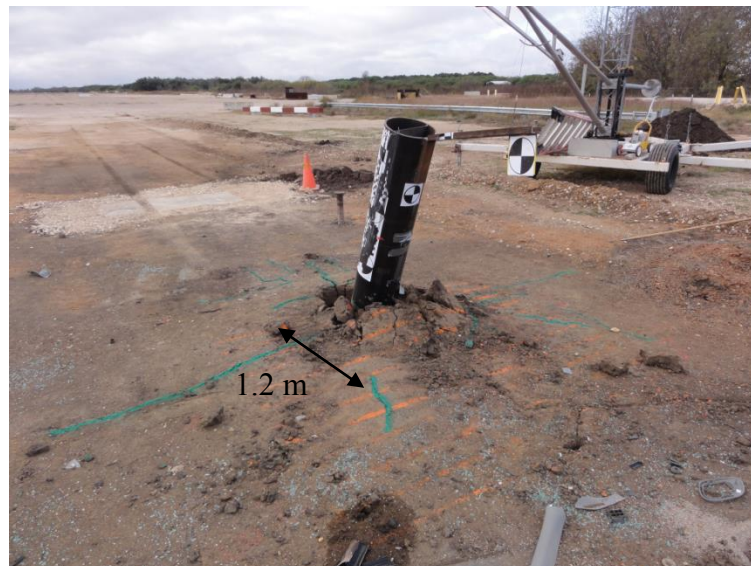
Soil cracks and failure wedge after pickup truck impact test
